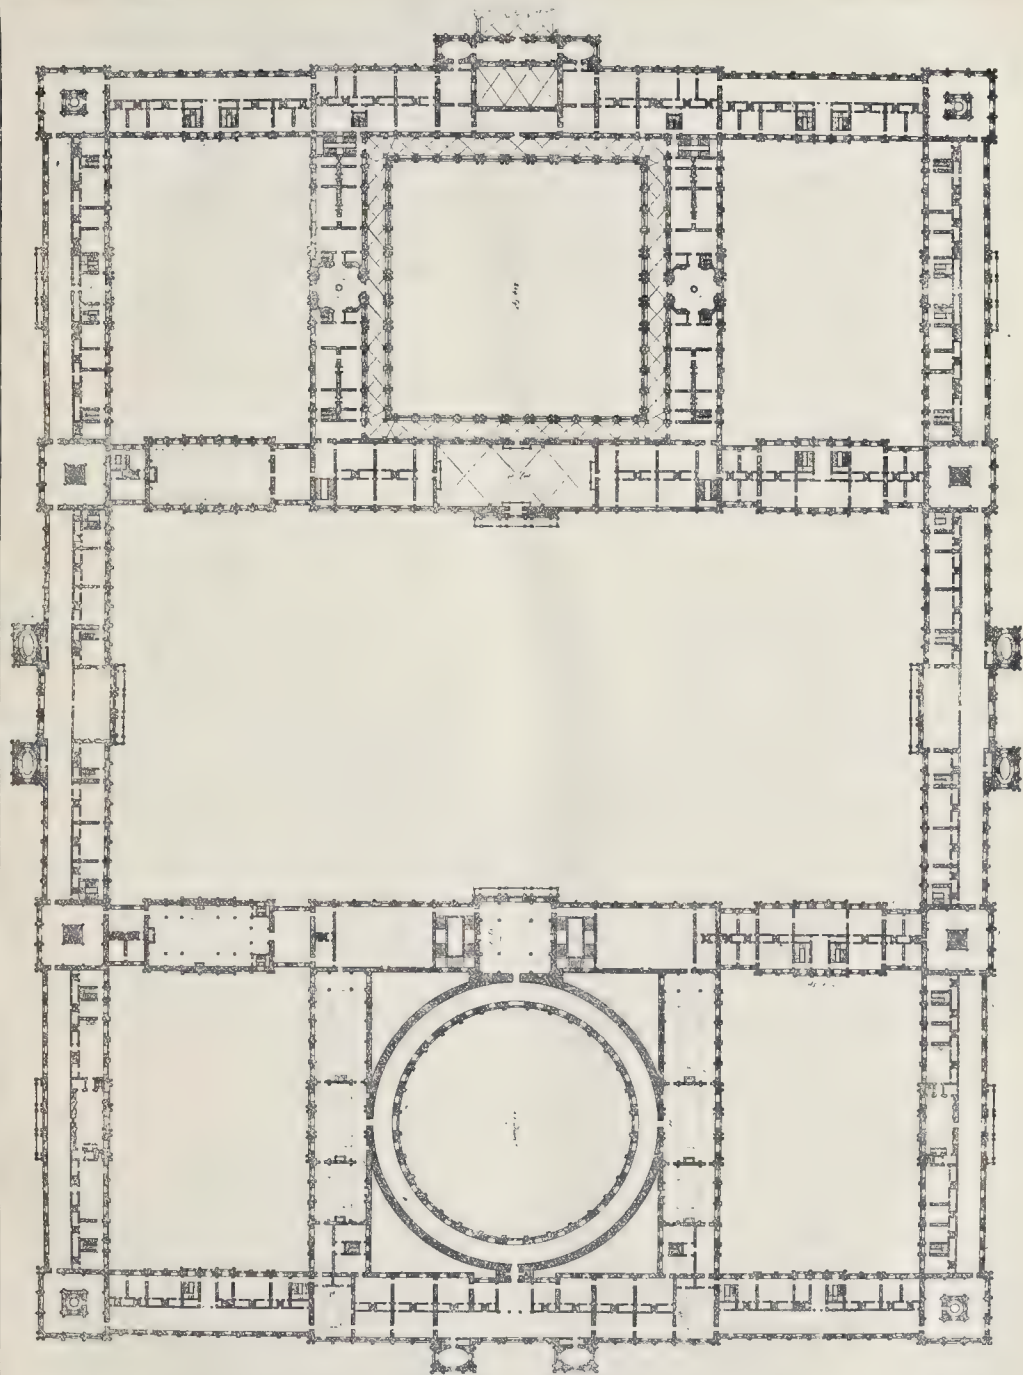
Inigo Jones's Plan for Whitehall Palace: the First Floor (from Kent).
